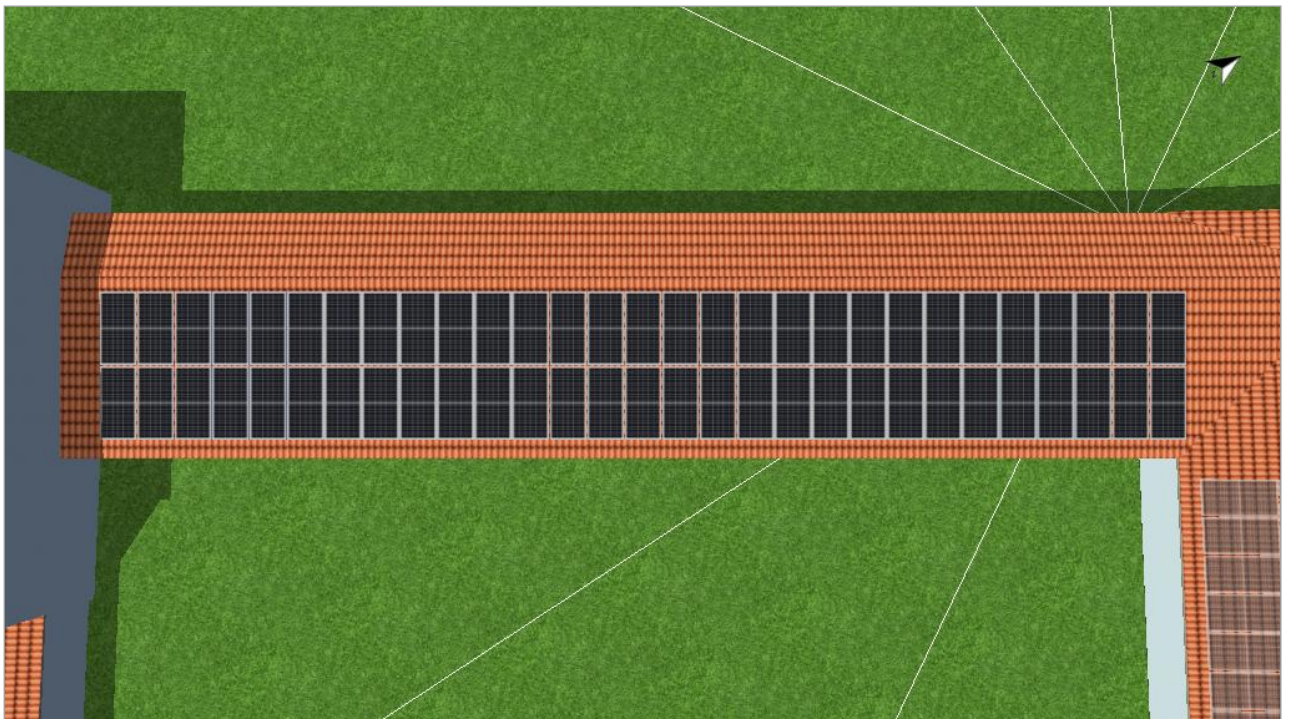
Modulyta - Building 02-Roof Area Southeast
